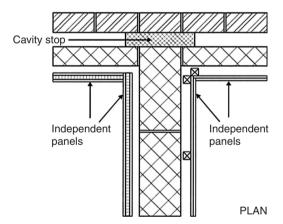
Wall type 3 – external cavity wall with masonry inner leaf
